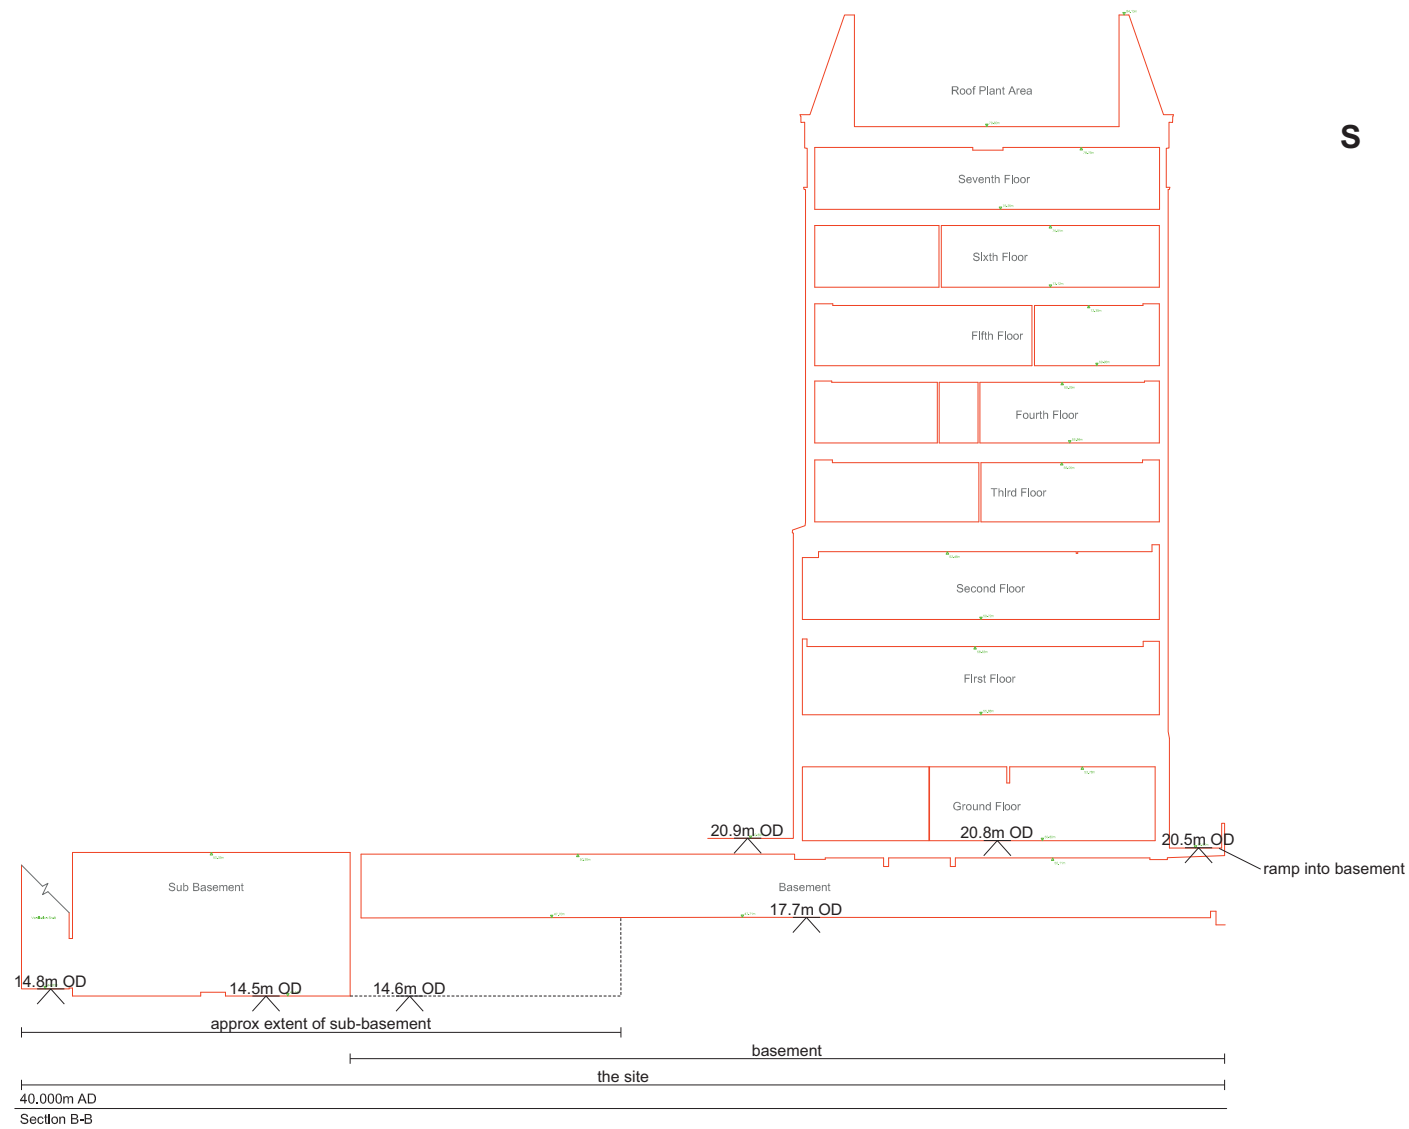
West facing section through existing building (Omega Geomatics, dwg no. 2/2, April 2011)
